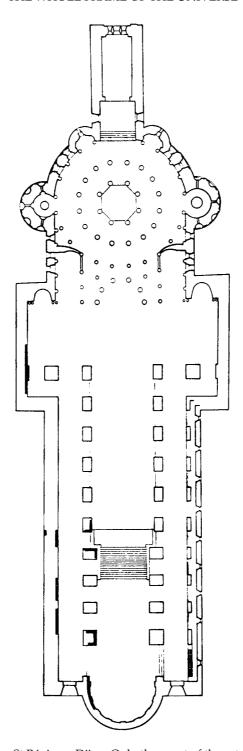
Plan, St Bénigne, Dijon. Only the crypt of the rotunda survives
